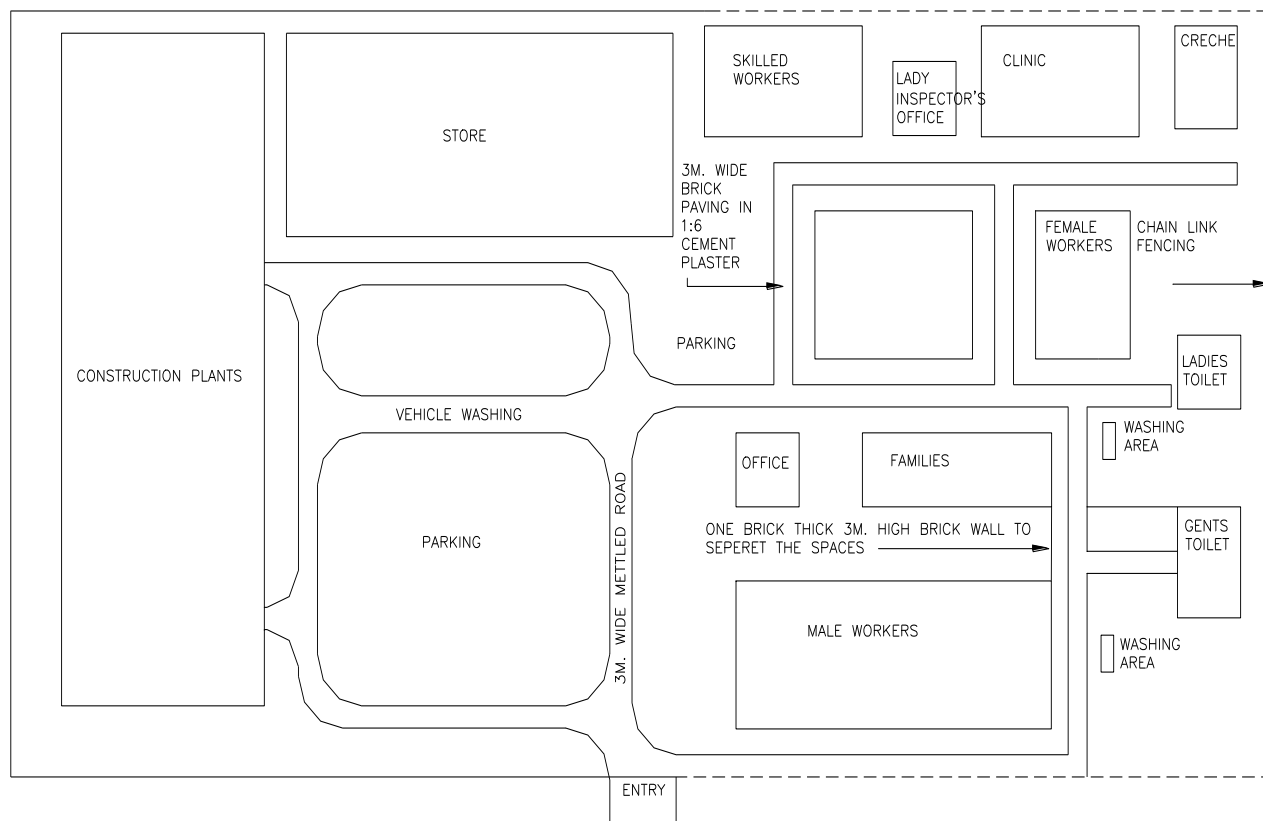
FIGURE A: TYPICAL LAYOUT OF CONSTRUCTION CAMP
